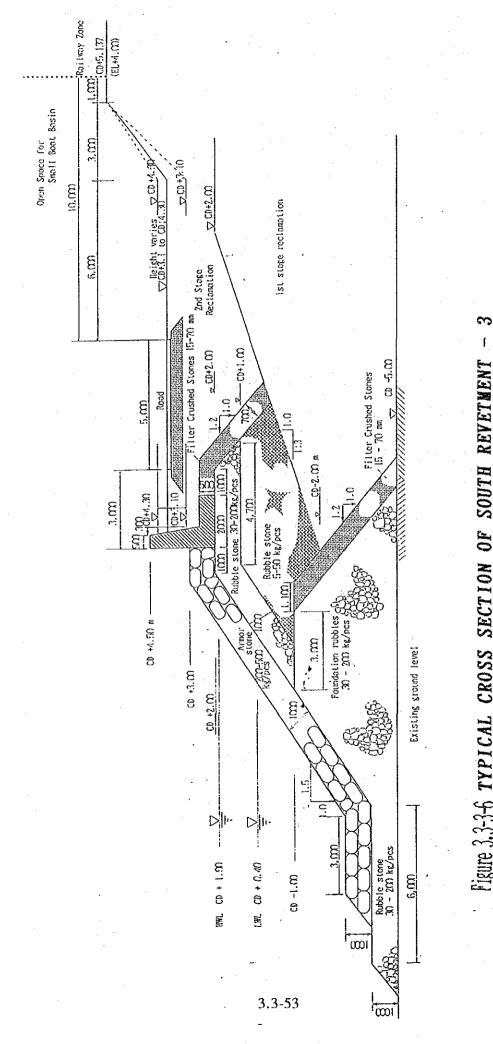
TYPICAL CROSS SECTION OF SOUTH REVETMENT SECTION G - G
